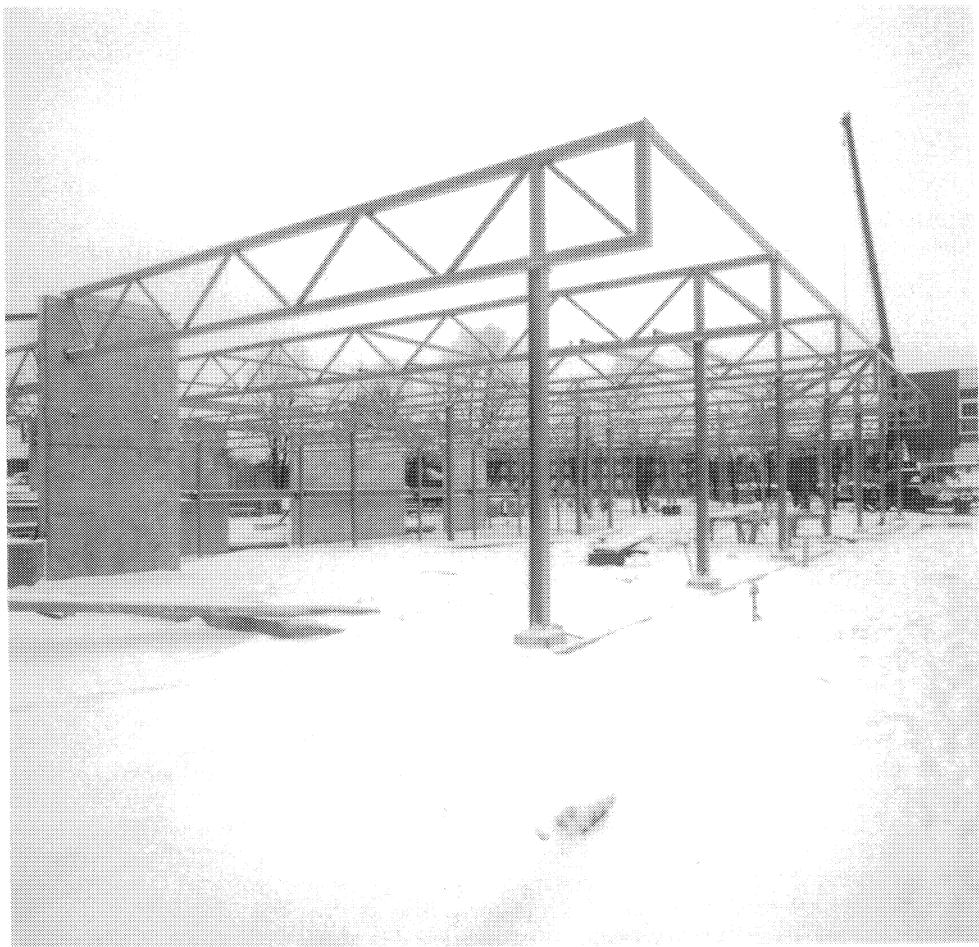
Hollow section structure with joints using no gusset or connection plates
